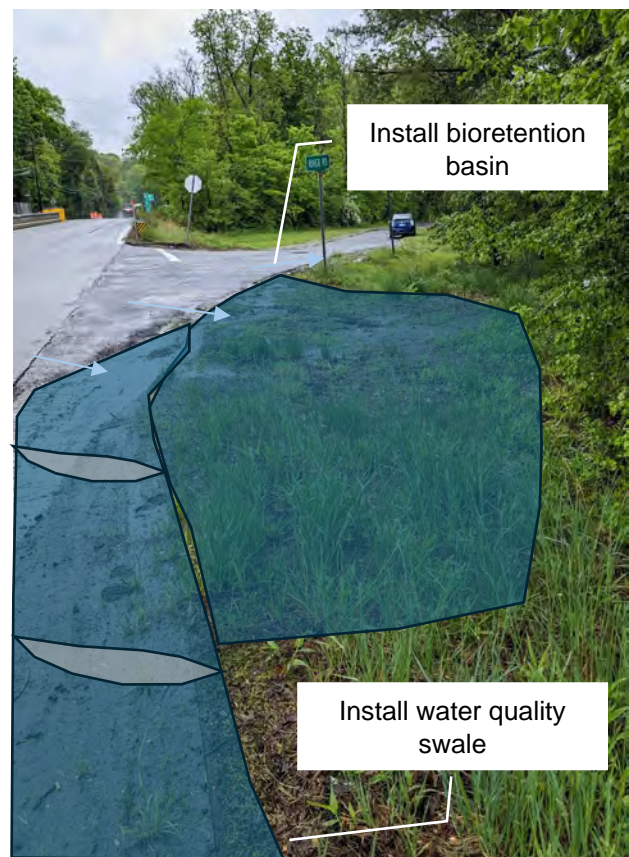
A-2: Shoulder at the intersection of River Road and Main Street
